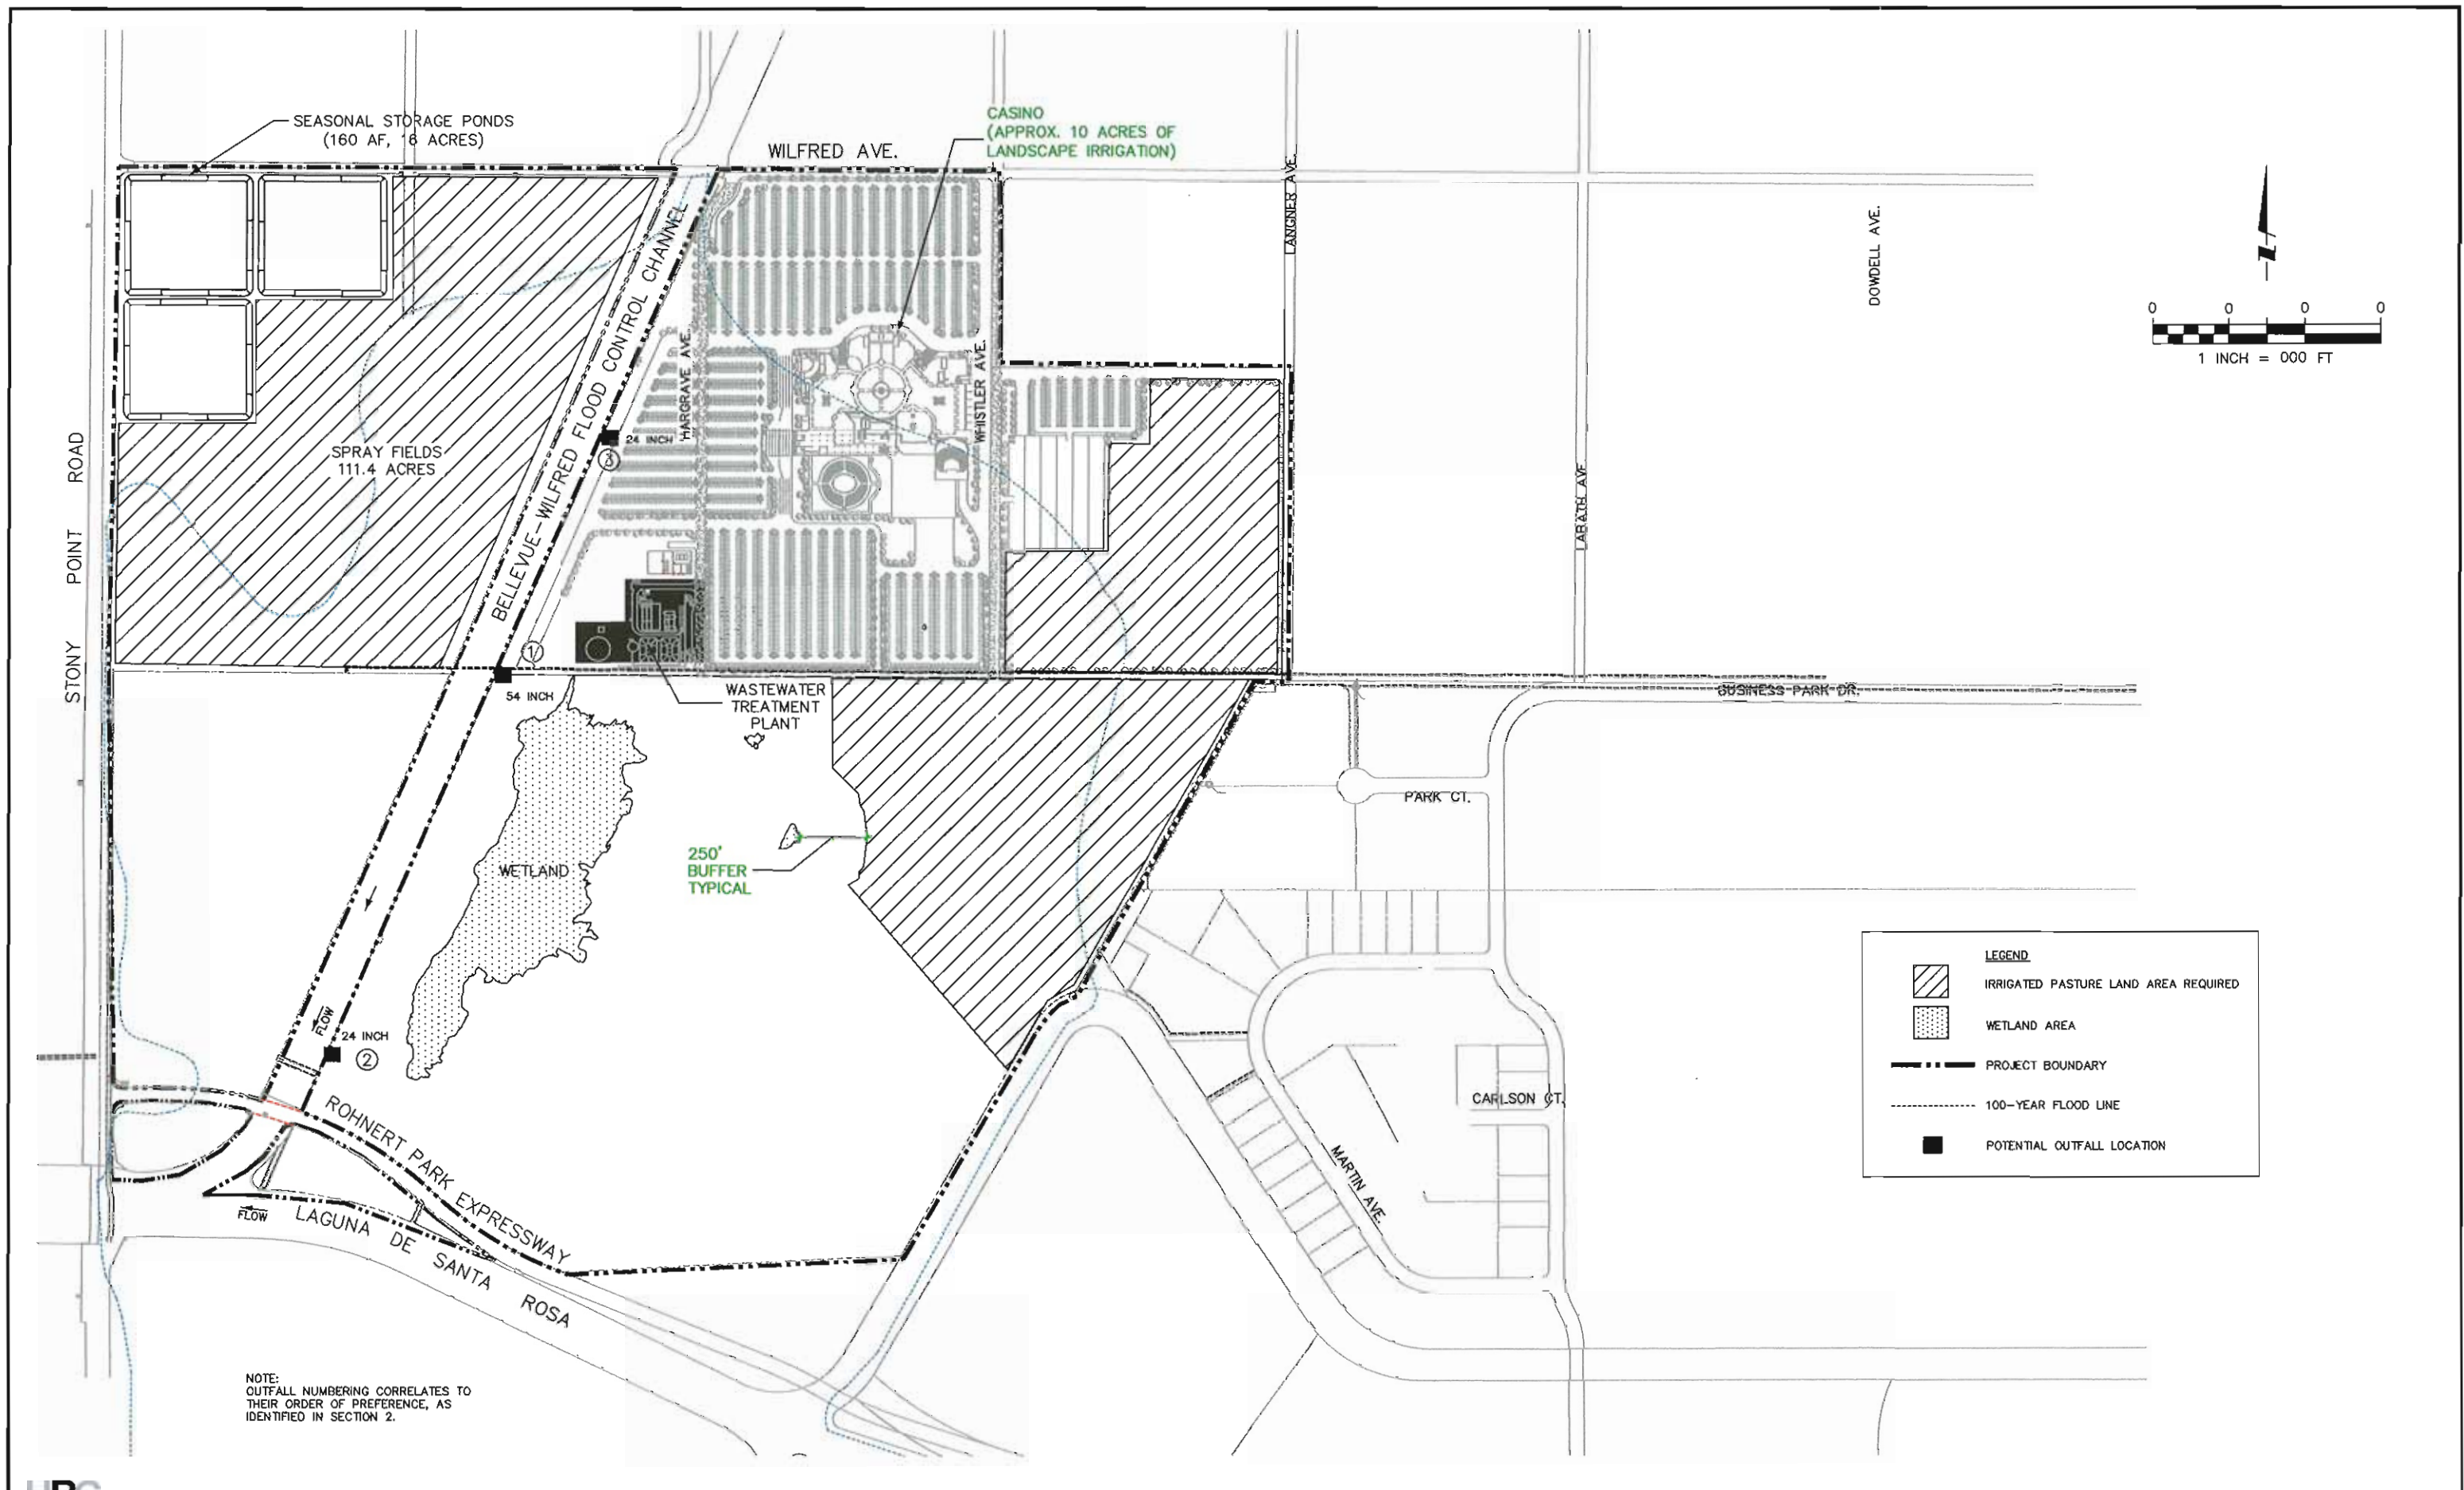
Project Development Plan for Alternative C - Wet Season Storage (Alternative C2)
